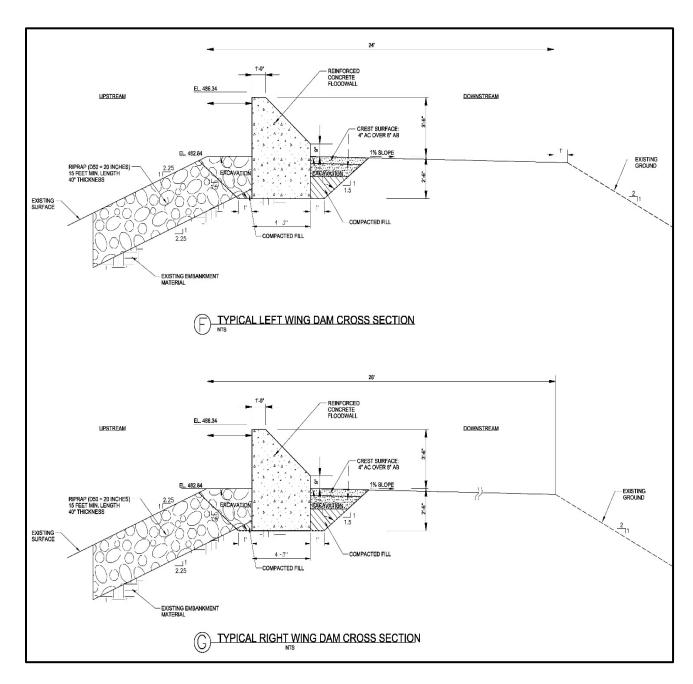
Preliminary typical cross sections for new floodwalls at the Left Wing Dam (LWD) and the Right Wing Dam (RWD).
